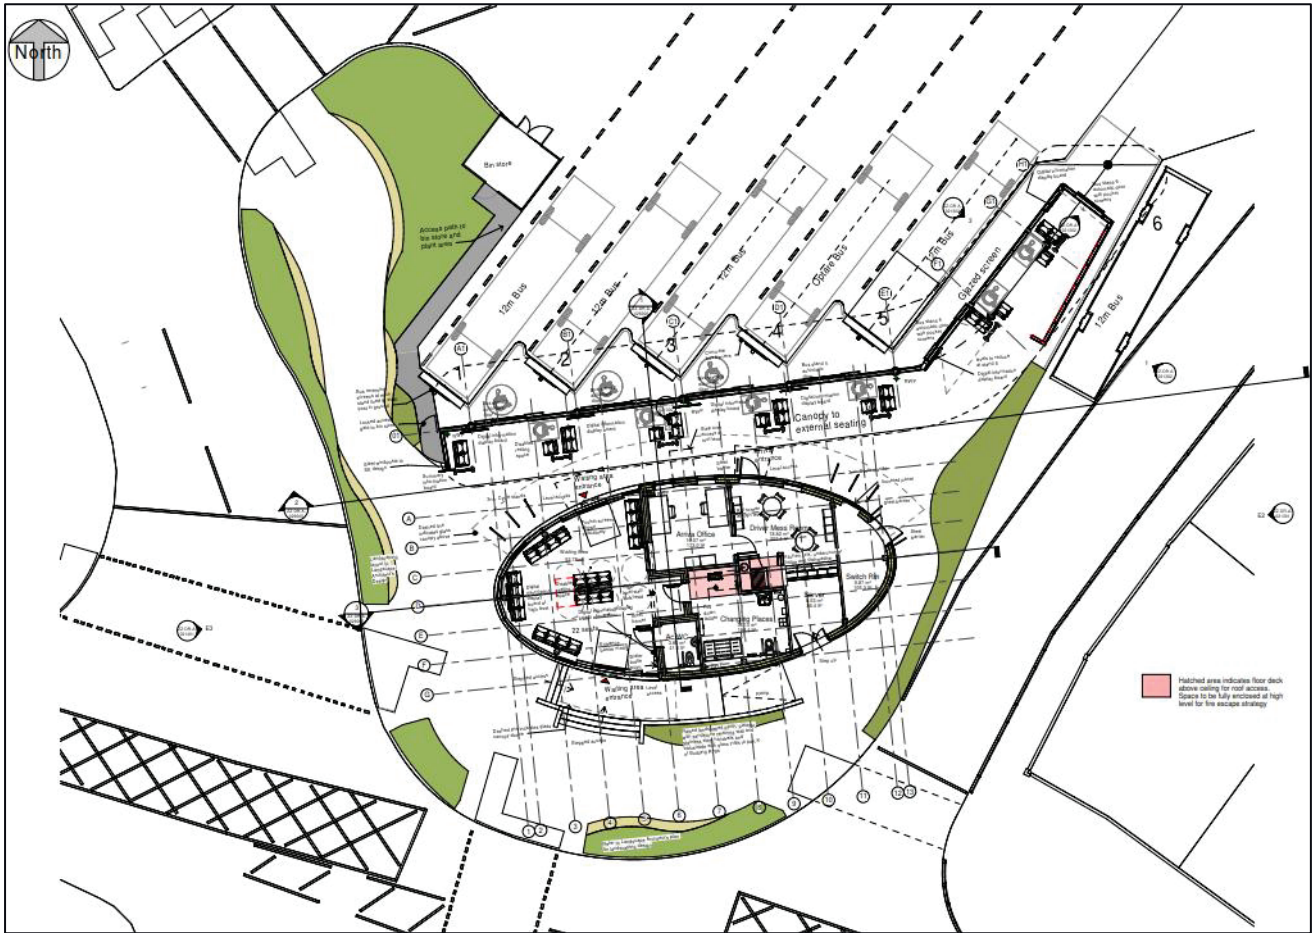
Proposed GA Plan for the proposed new building and bus stands
